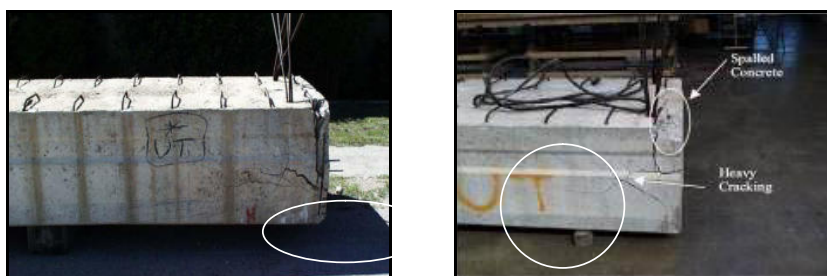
Spalled Concrete and Heavy Cracking
